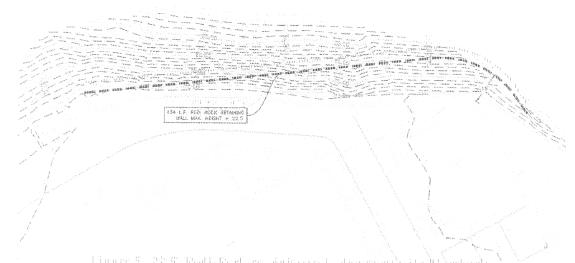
22.5' Redi-Rock retaining wall alignment with 9' setback.
